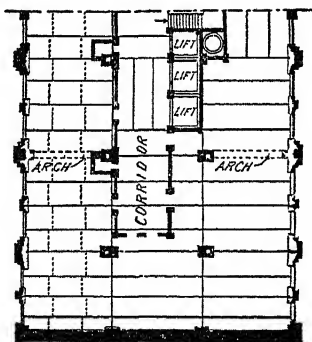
PORTAL TYPE OF WIND BRACING—HALF PLAN.
